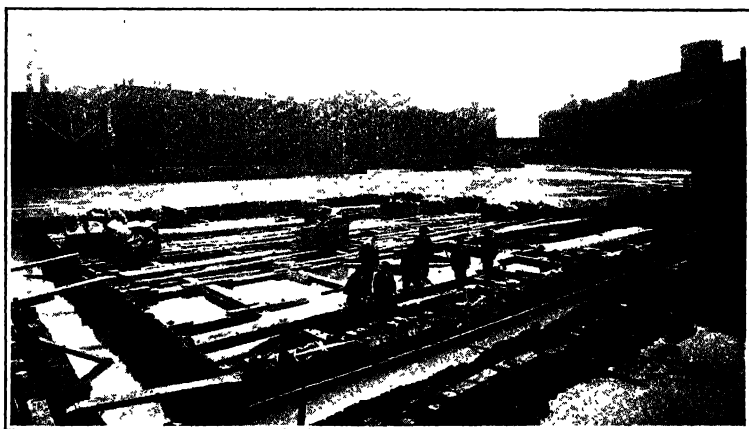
Puddle wall cofferdam showing combination of wooden and steel sheet piling.
